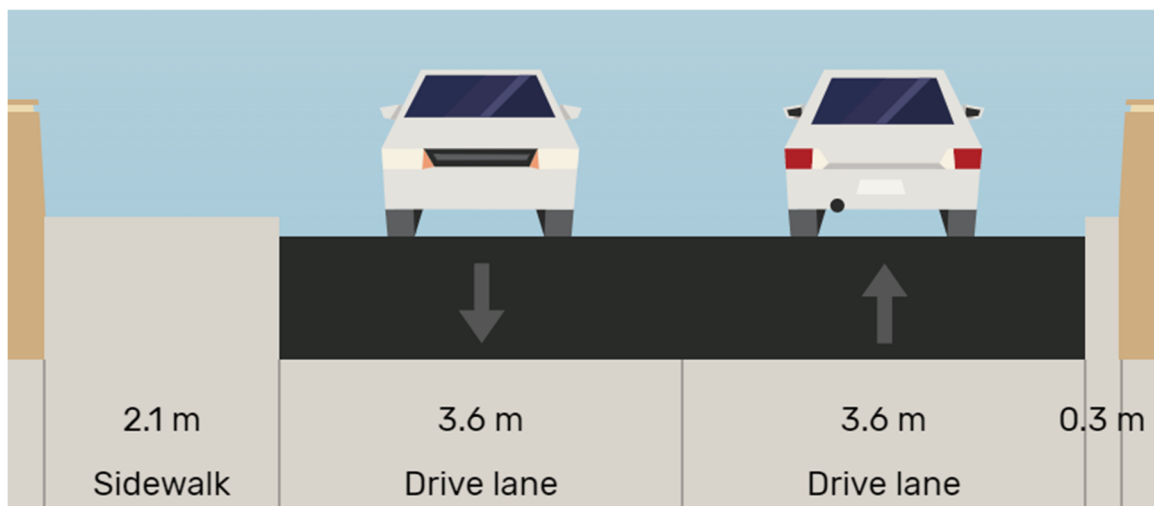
Modified Bridge Cross Section – Option 2 (for illustration purposes only)
